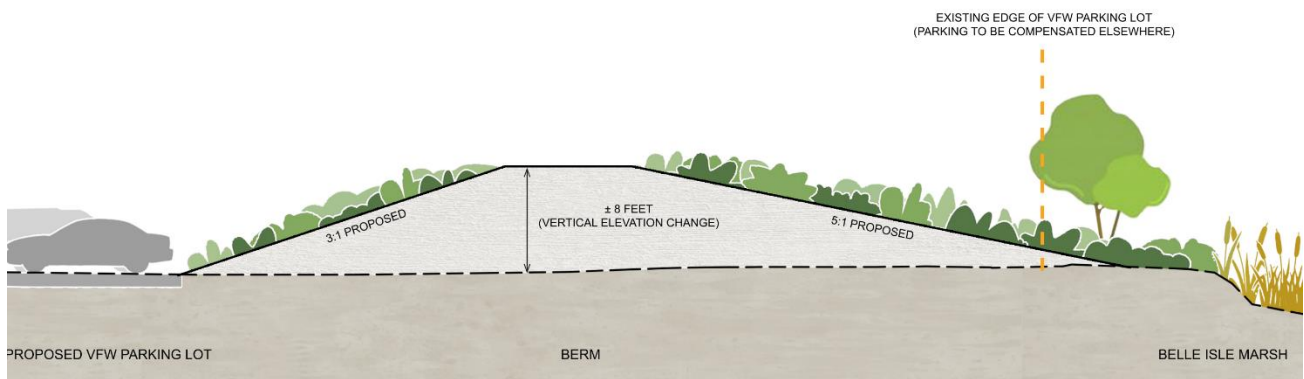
Alternative VFW-1 Living Levee with Parking Compensation—Illustrative Cross Section (Terraink)
